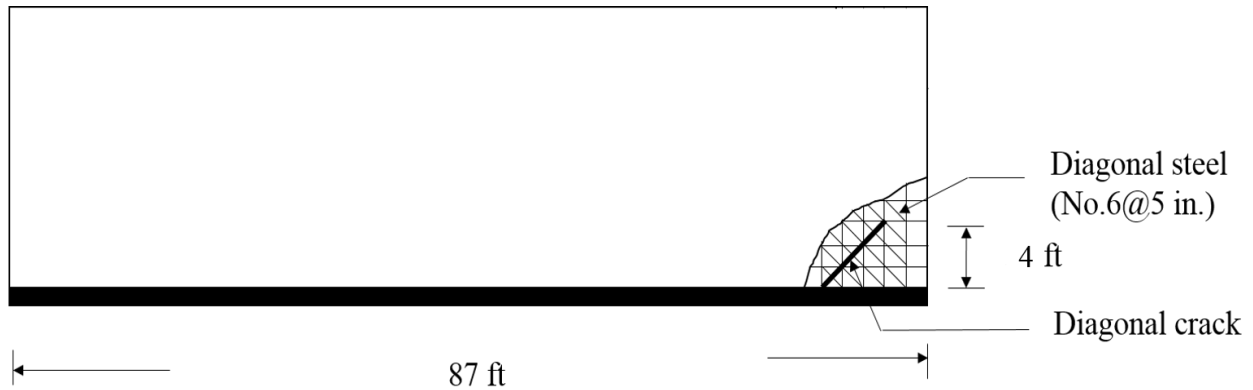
Crack geometry and reinforcement steel distribution on model-3
